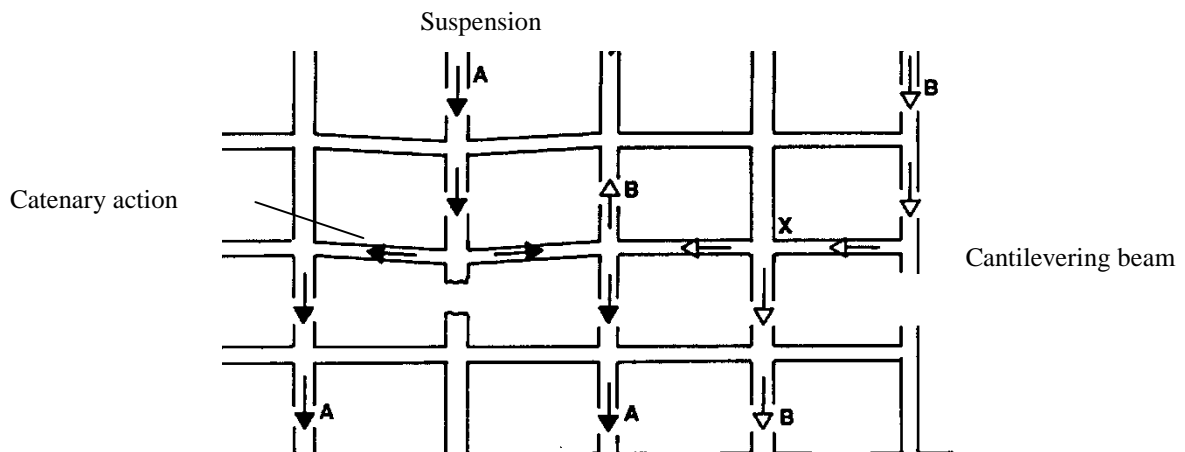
Alternative means of protection against progressive collapse in skeletal structures
